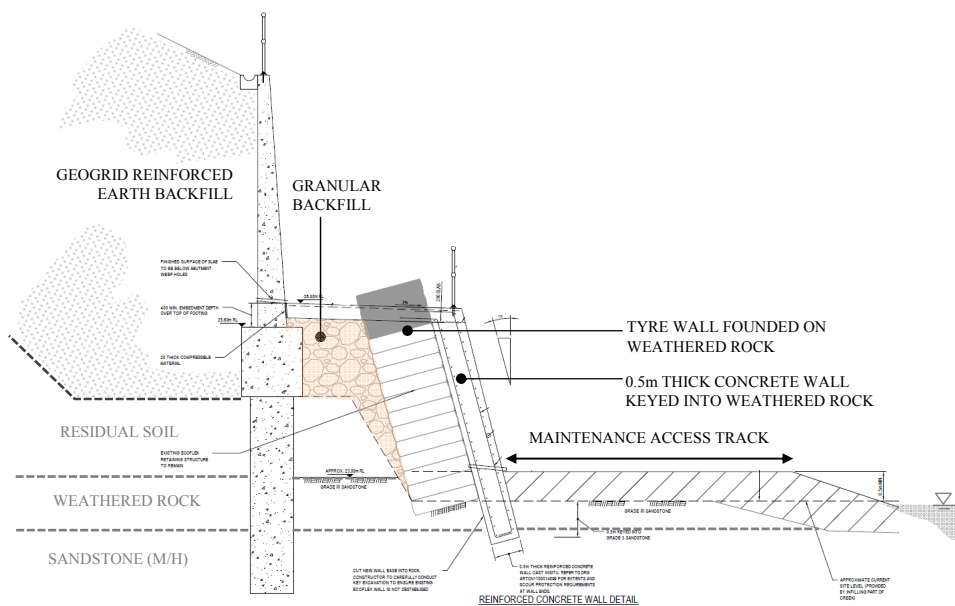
Modified permanent retaining wall configuration with the 0.5m thick concrete wall
